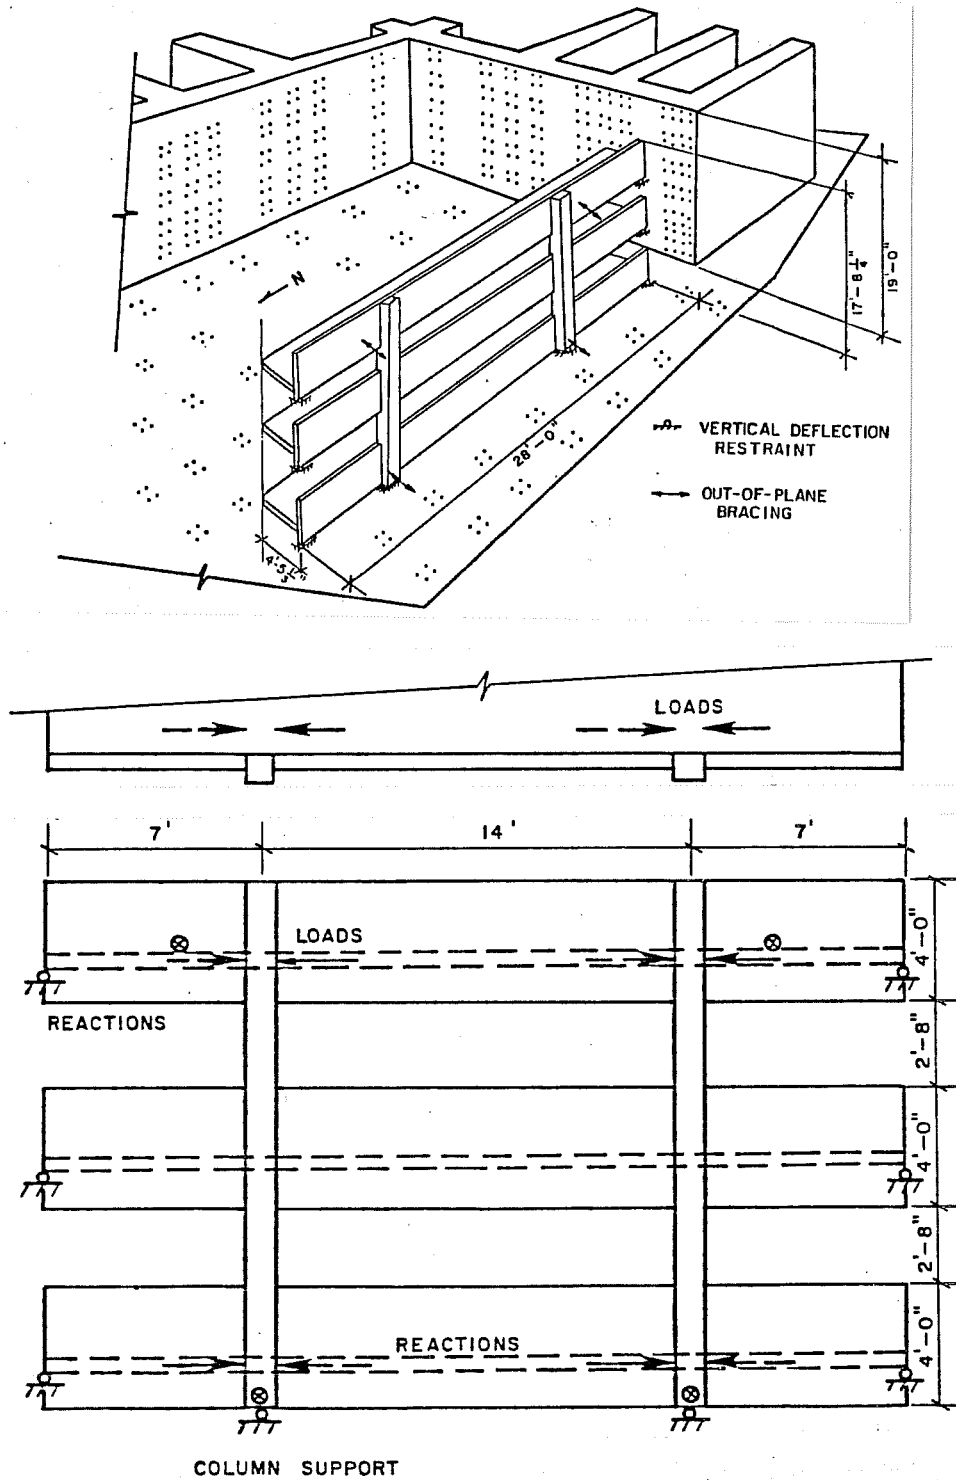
Frame model, boundary conditions and test set up [29]
